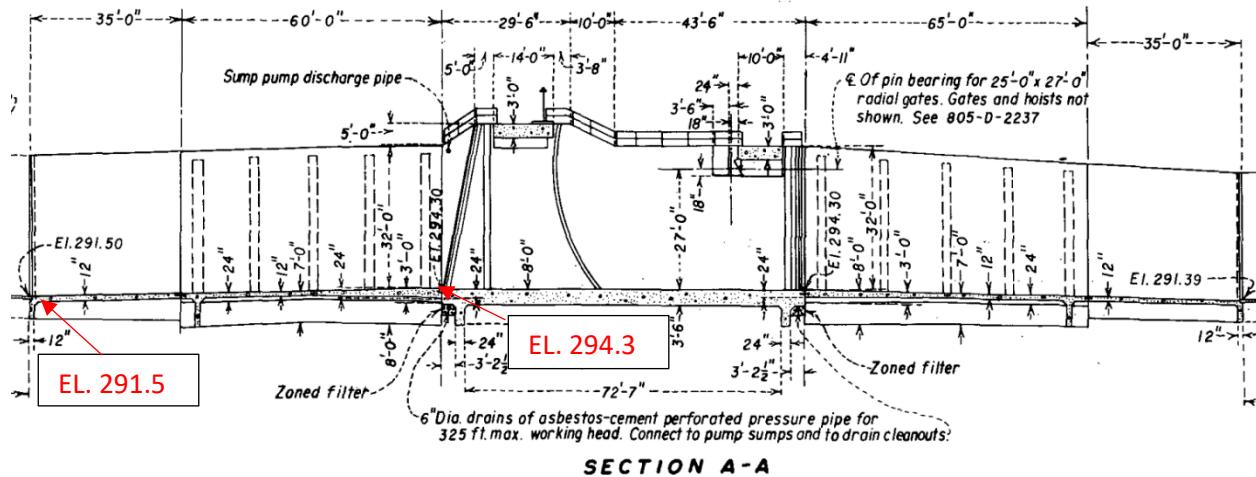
Typical California Aqueduct Hydraulic Model Cross Section
